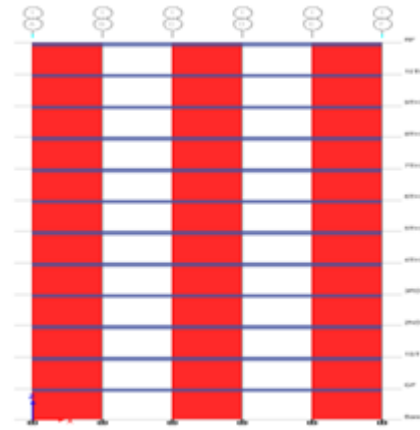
Elevation of Solid Shear Wall Structure Model 02
